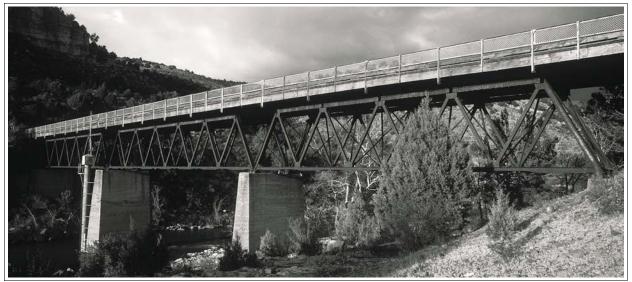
Black River Bridge (03128), 2002. (Trusses shown are replacement spans, erected in 1929 over original concrete piers).
